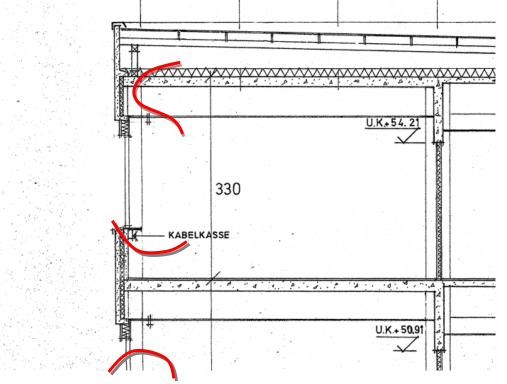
typical section of the original design of the building (ill. Harboe og Leganger AS)
